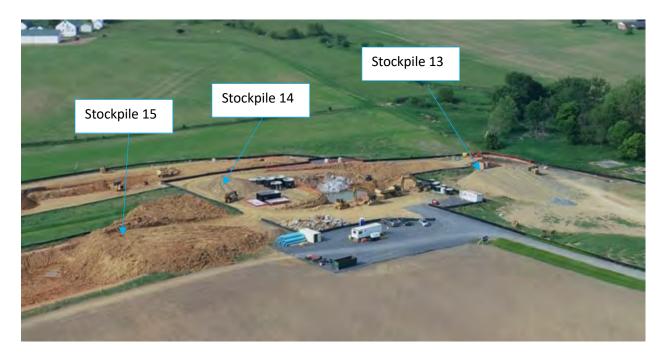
Sewer Pump Station Excavation – 05/17/2023
